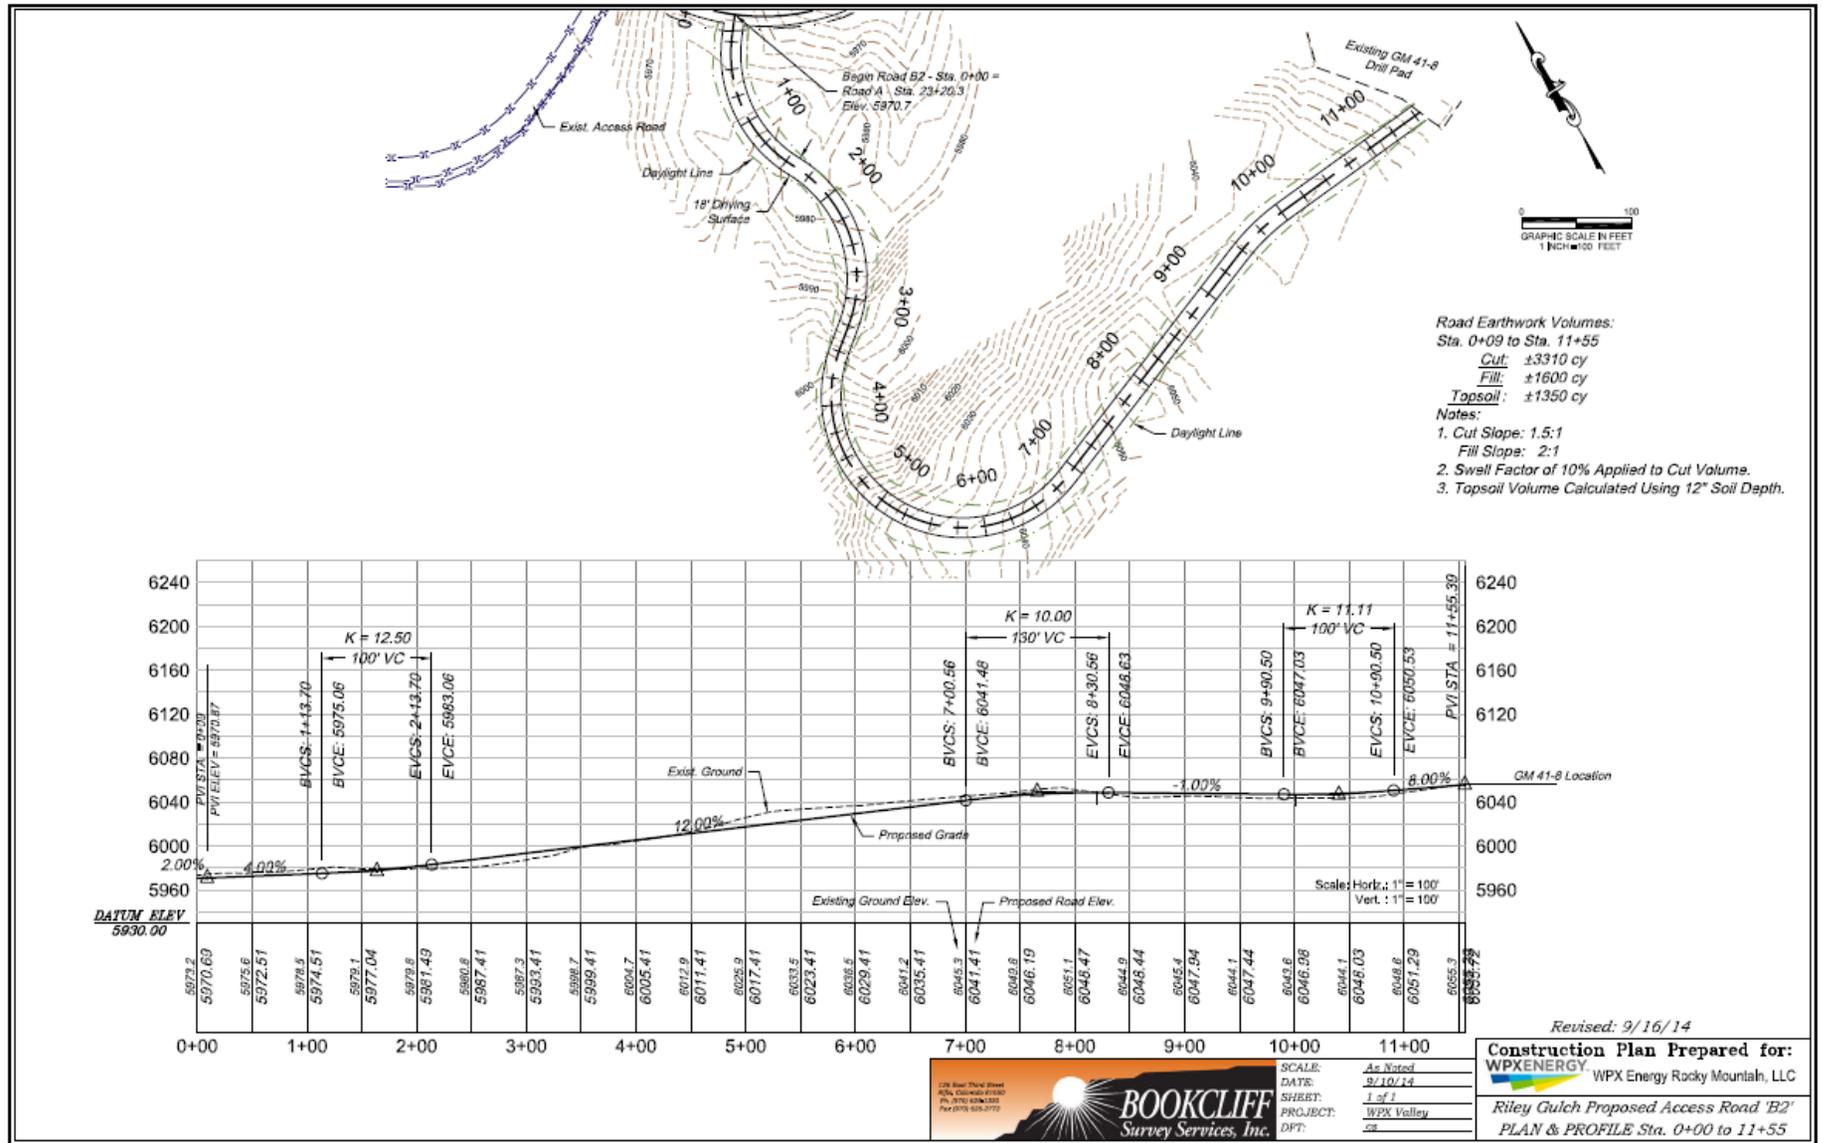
Phase 1 - New Road Connection to the GM 41-8 Pad.
